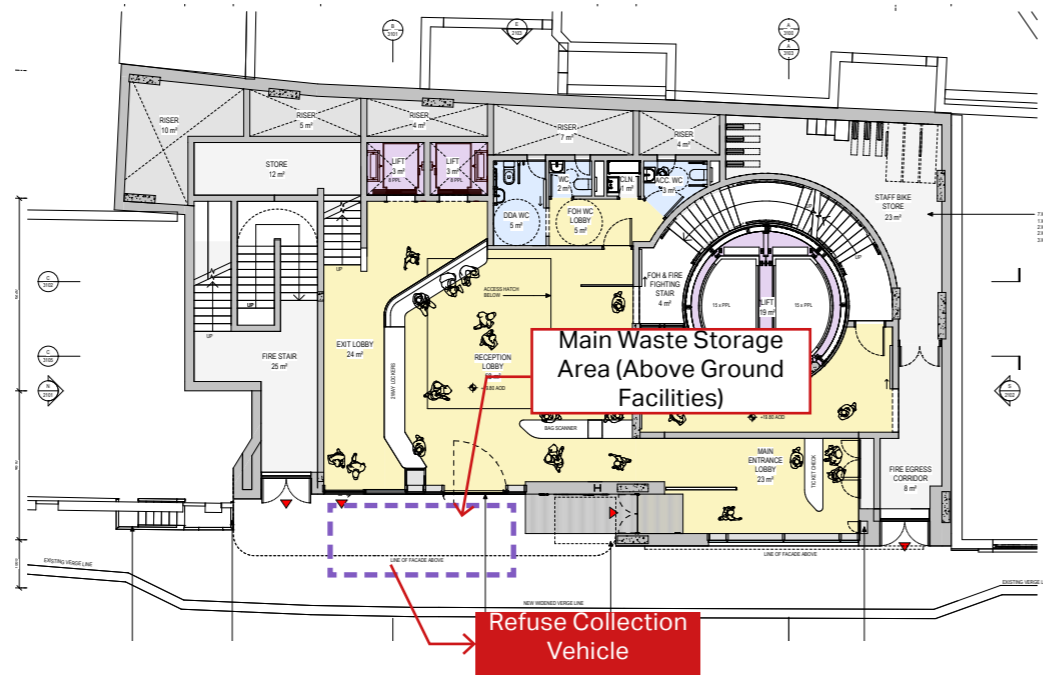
Presentation area and refuse collection at 38-41 Furnival Street
